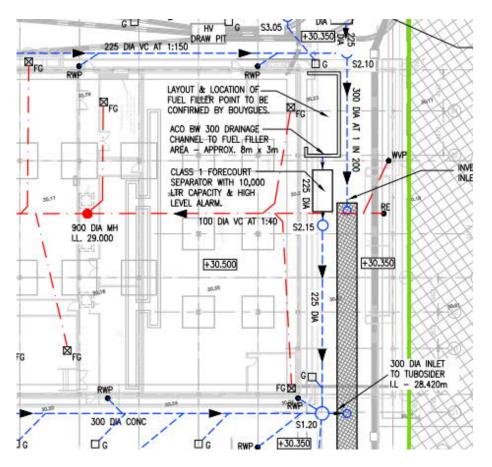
LON2 example drainage detail (North generator room/fuel fill point)
